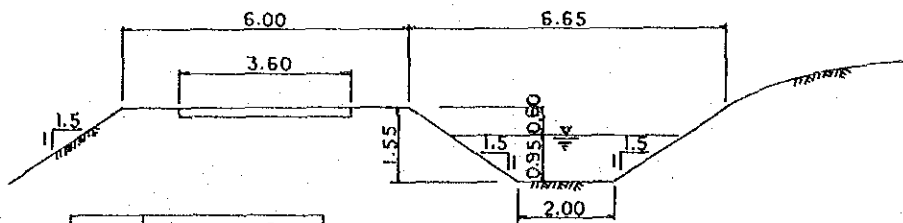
TYPICAL SECTIONS OF MAIN & BRANCH CANALS
